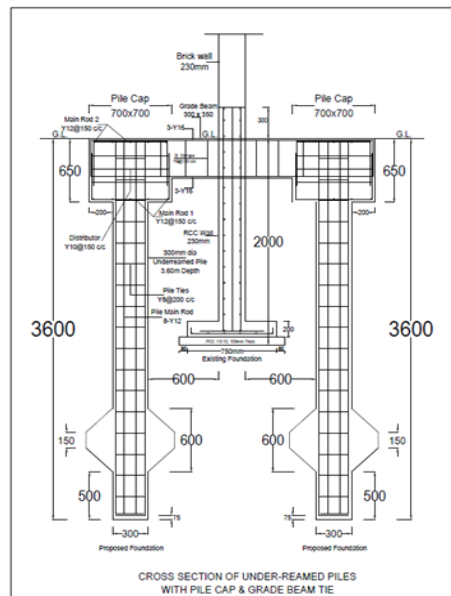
Cross section of Under- Reamed piles with pile cap and grade beam tie
